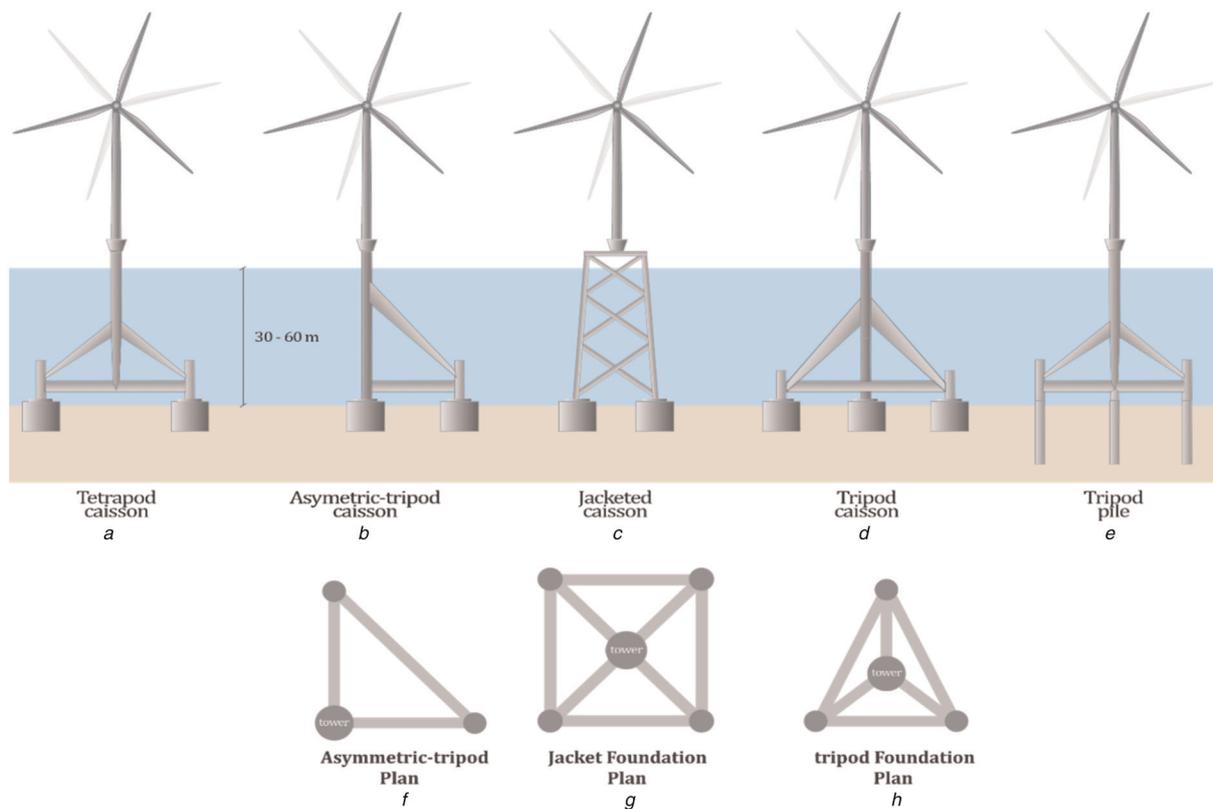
Various proposed and existing multi-foundation arrangements to support WTG
